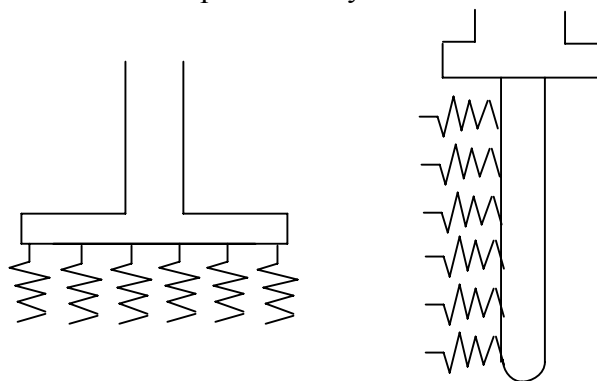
On strip footings or piles, a foundation has a certain rigidity k_{sol}
